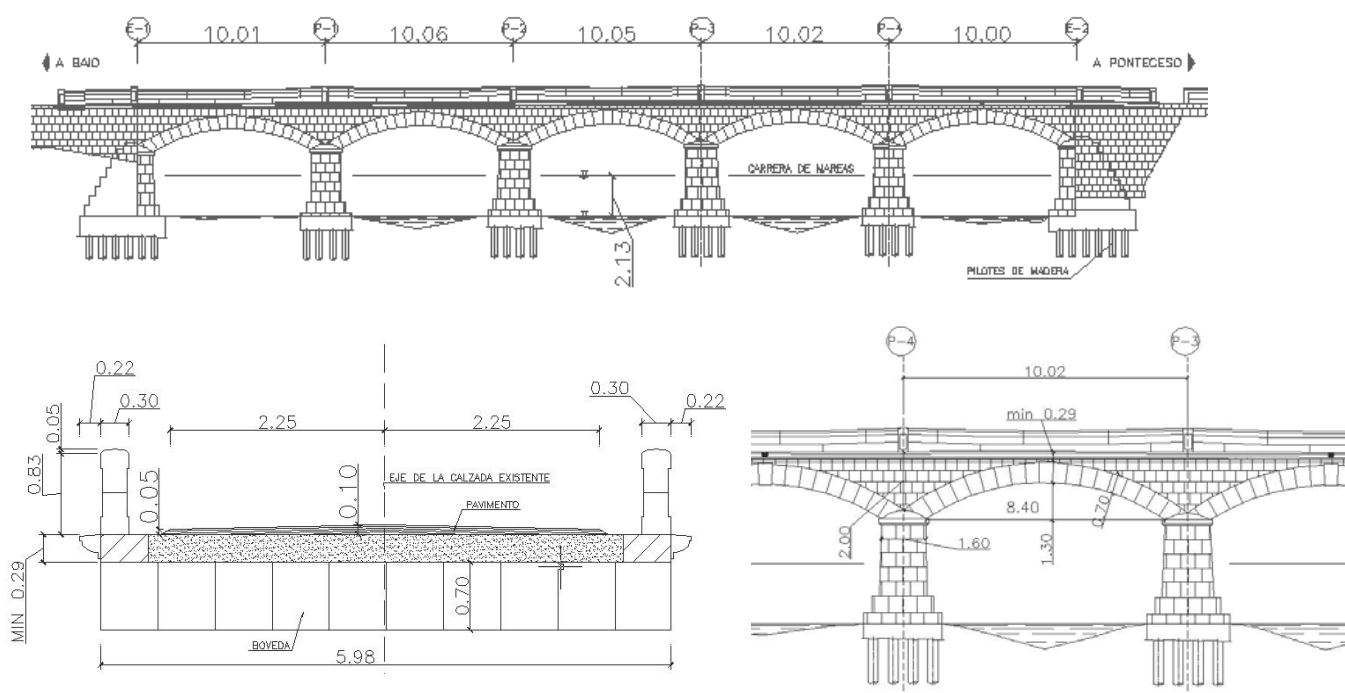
Elevation, cross section at crown and details of the bridge prior to intervention.
